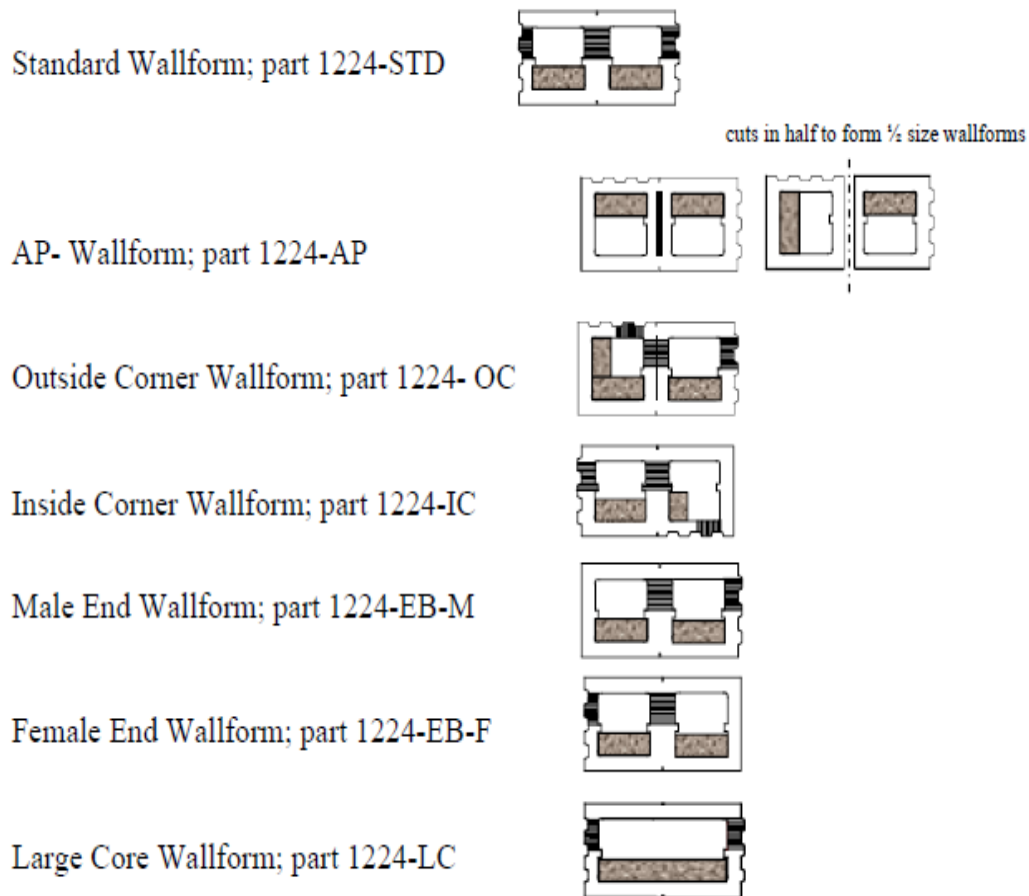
Faswall block configurations. Image from ShelterWorks, LTD (2010).
